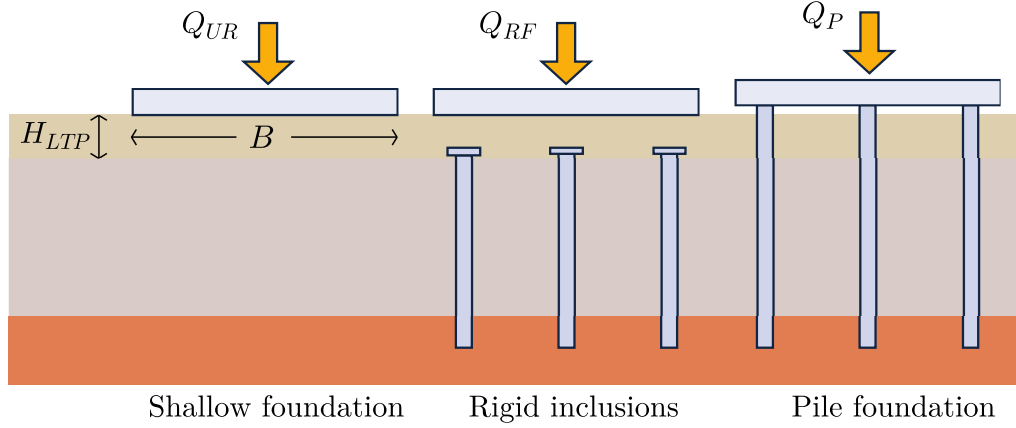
Typical configurations of (a) a shallow foundation; (b) a RI foundation; and (c) a pile group foundation, based on IREX (2012)
